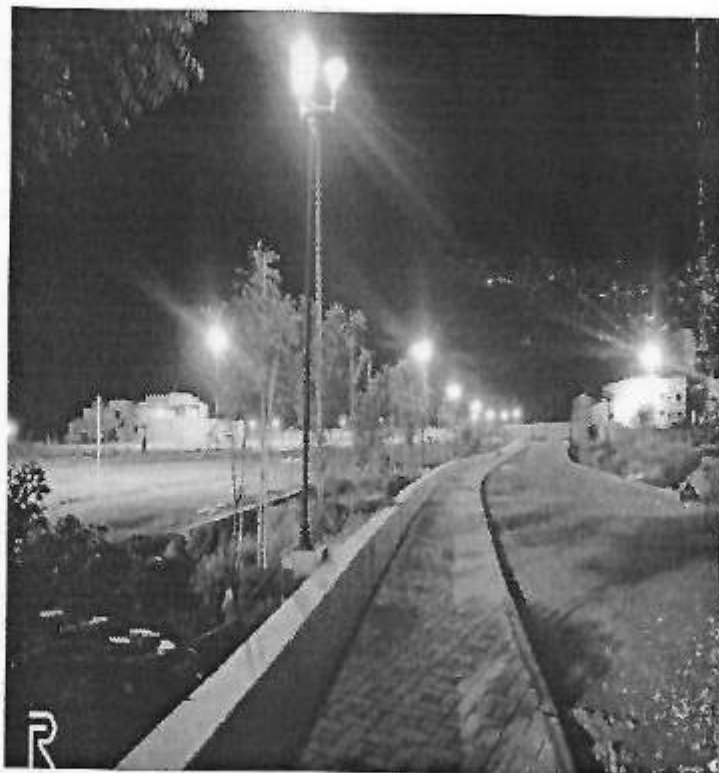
LED lights at colony street lighting, garden, public place and houses.
